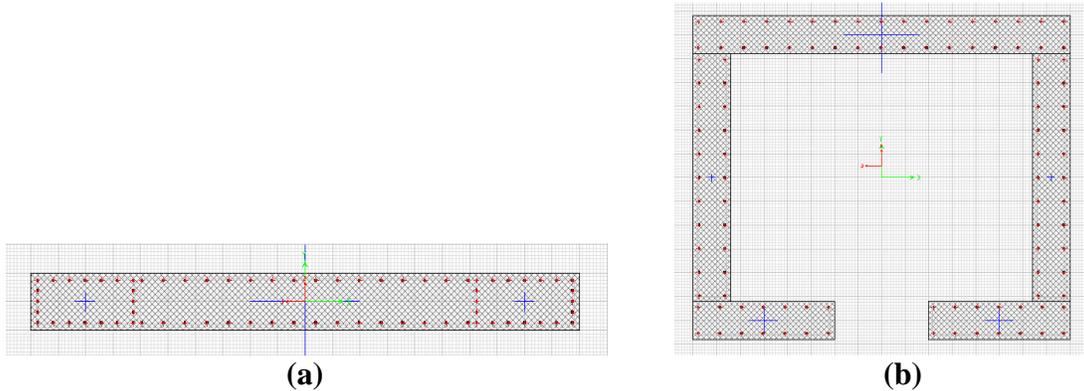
(a) Frame section of planner wall; (b) Frame section of core wall with opening (link beam above the opening is not considered)
